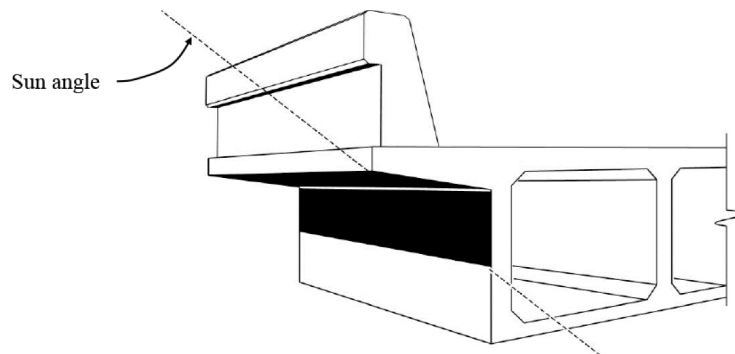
Typical Shadow on Box Girder
